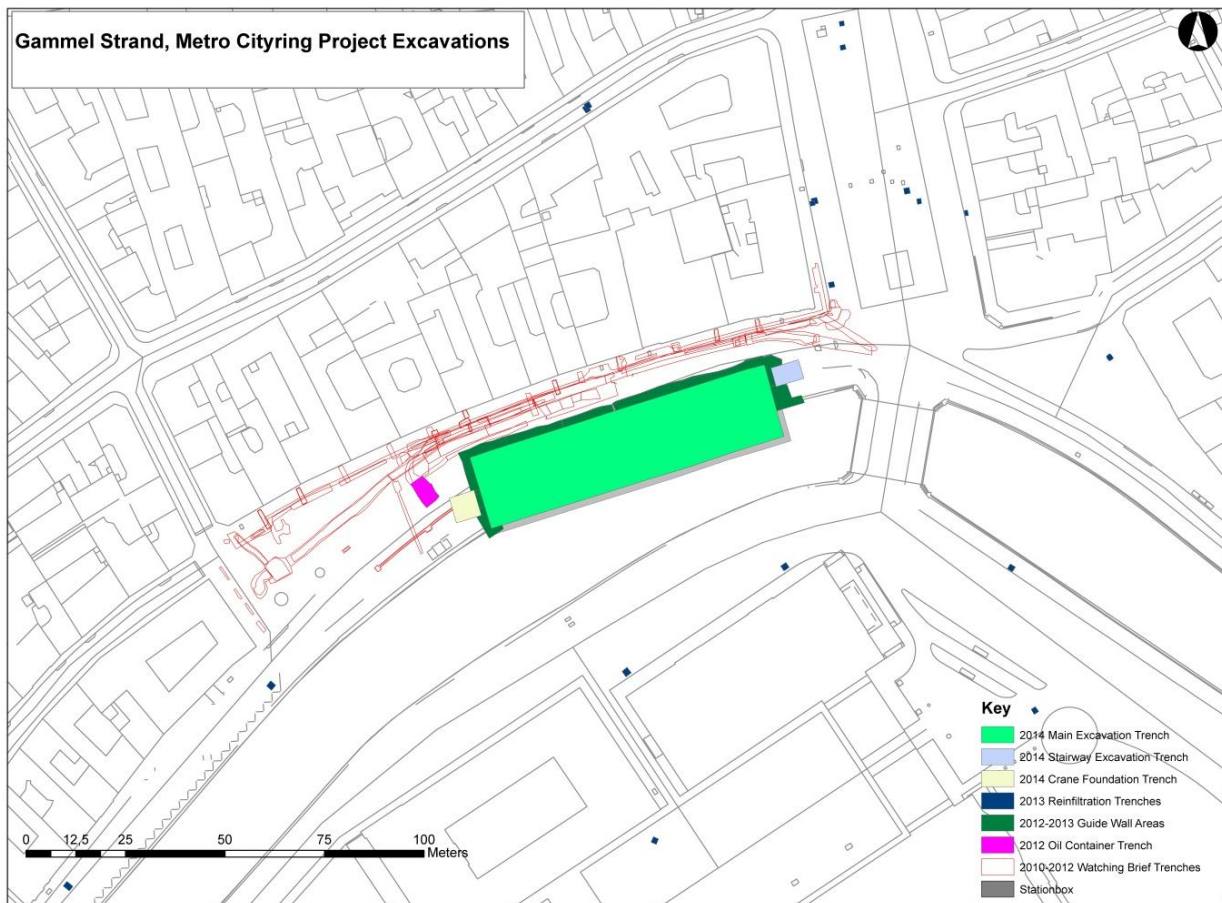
Plan showing the Gammel Strand Metro Cityring excavation trenches, and their dates
